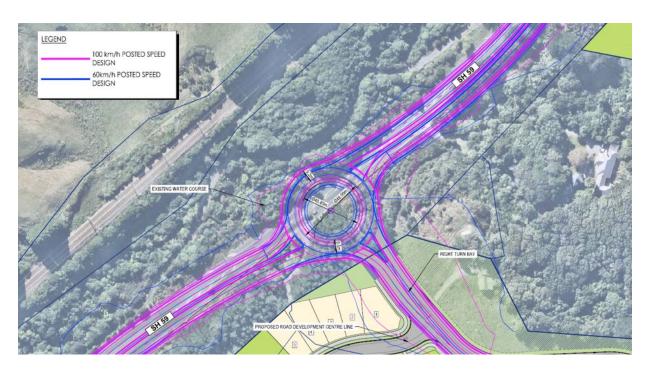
Concept Roundabout Designs for Site Access SH59
